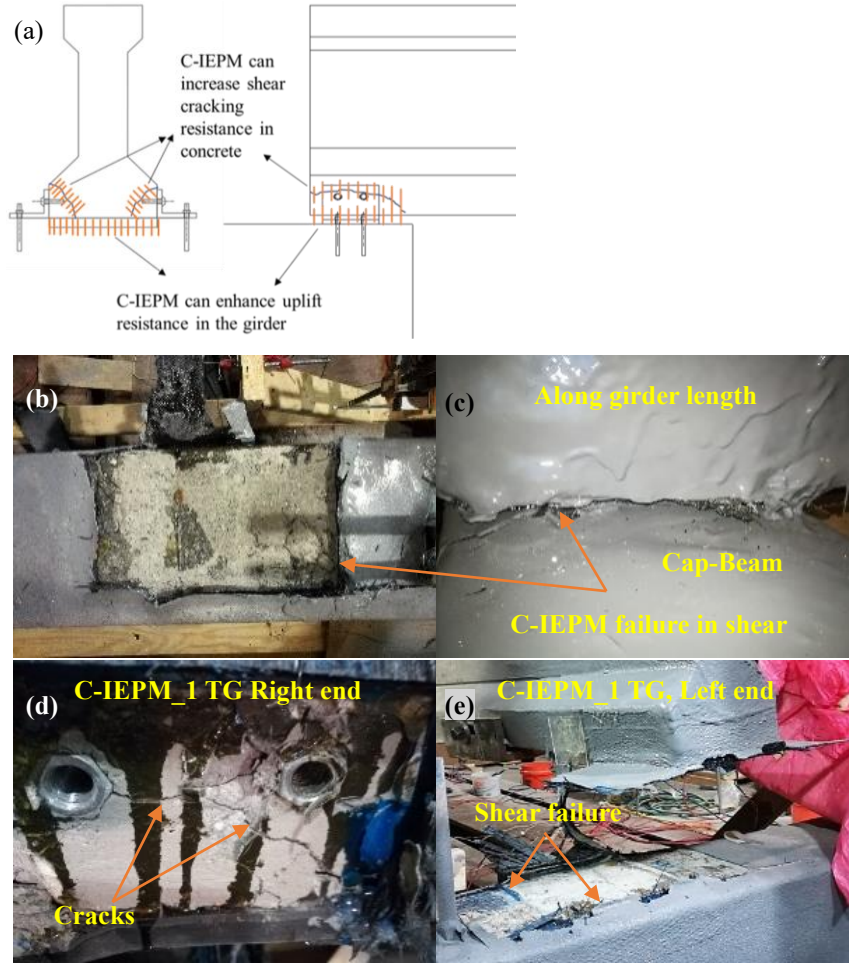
(a) Depiction of connection-detail strengthening system, comprised of either C-IEPM or CF/E composite and mechanical connectors joining the concrete girder and cap-beam; (b and c) Shear failure observed in C-IEPM (C-IEPM_0 TG); (d) concrete shear failure at non-mechanically connected left girder-end (cap-beam) of C-IEPM_1 TG; (e) C-IEPM shear failure at non-mechanically connected girder-end in C-IEPM_1 TG
